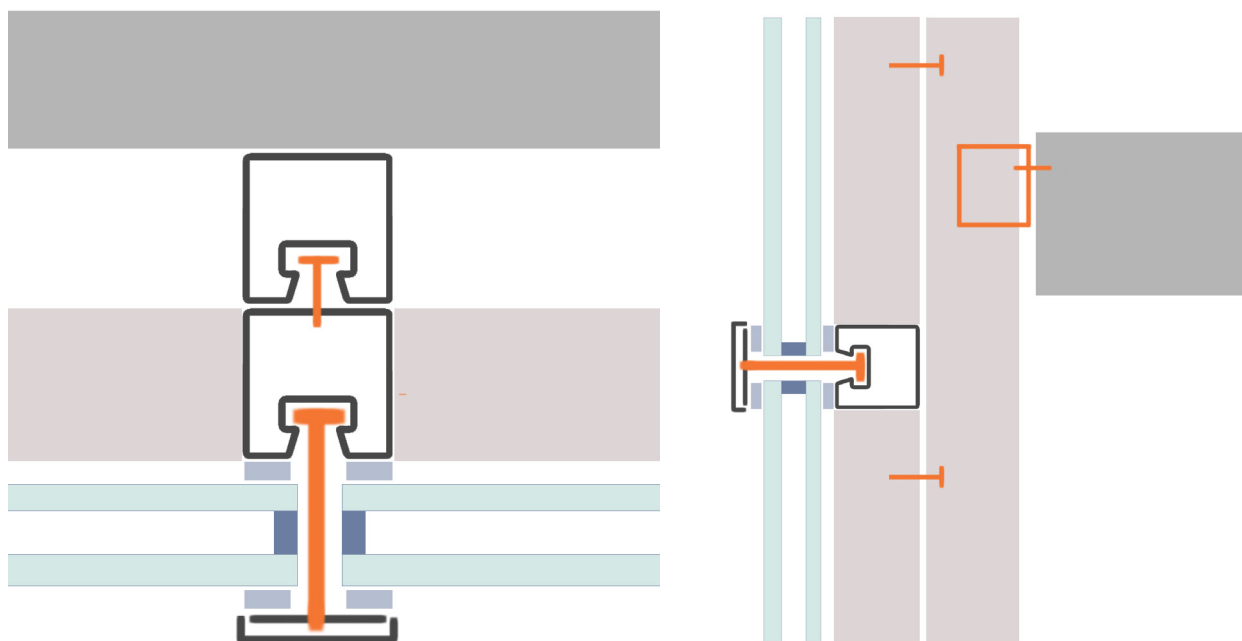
Design ideas for strengthening and fixing the mullion in (left) plan, and (right) section (source: author)
